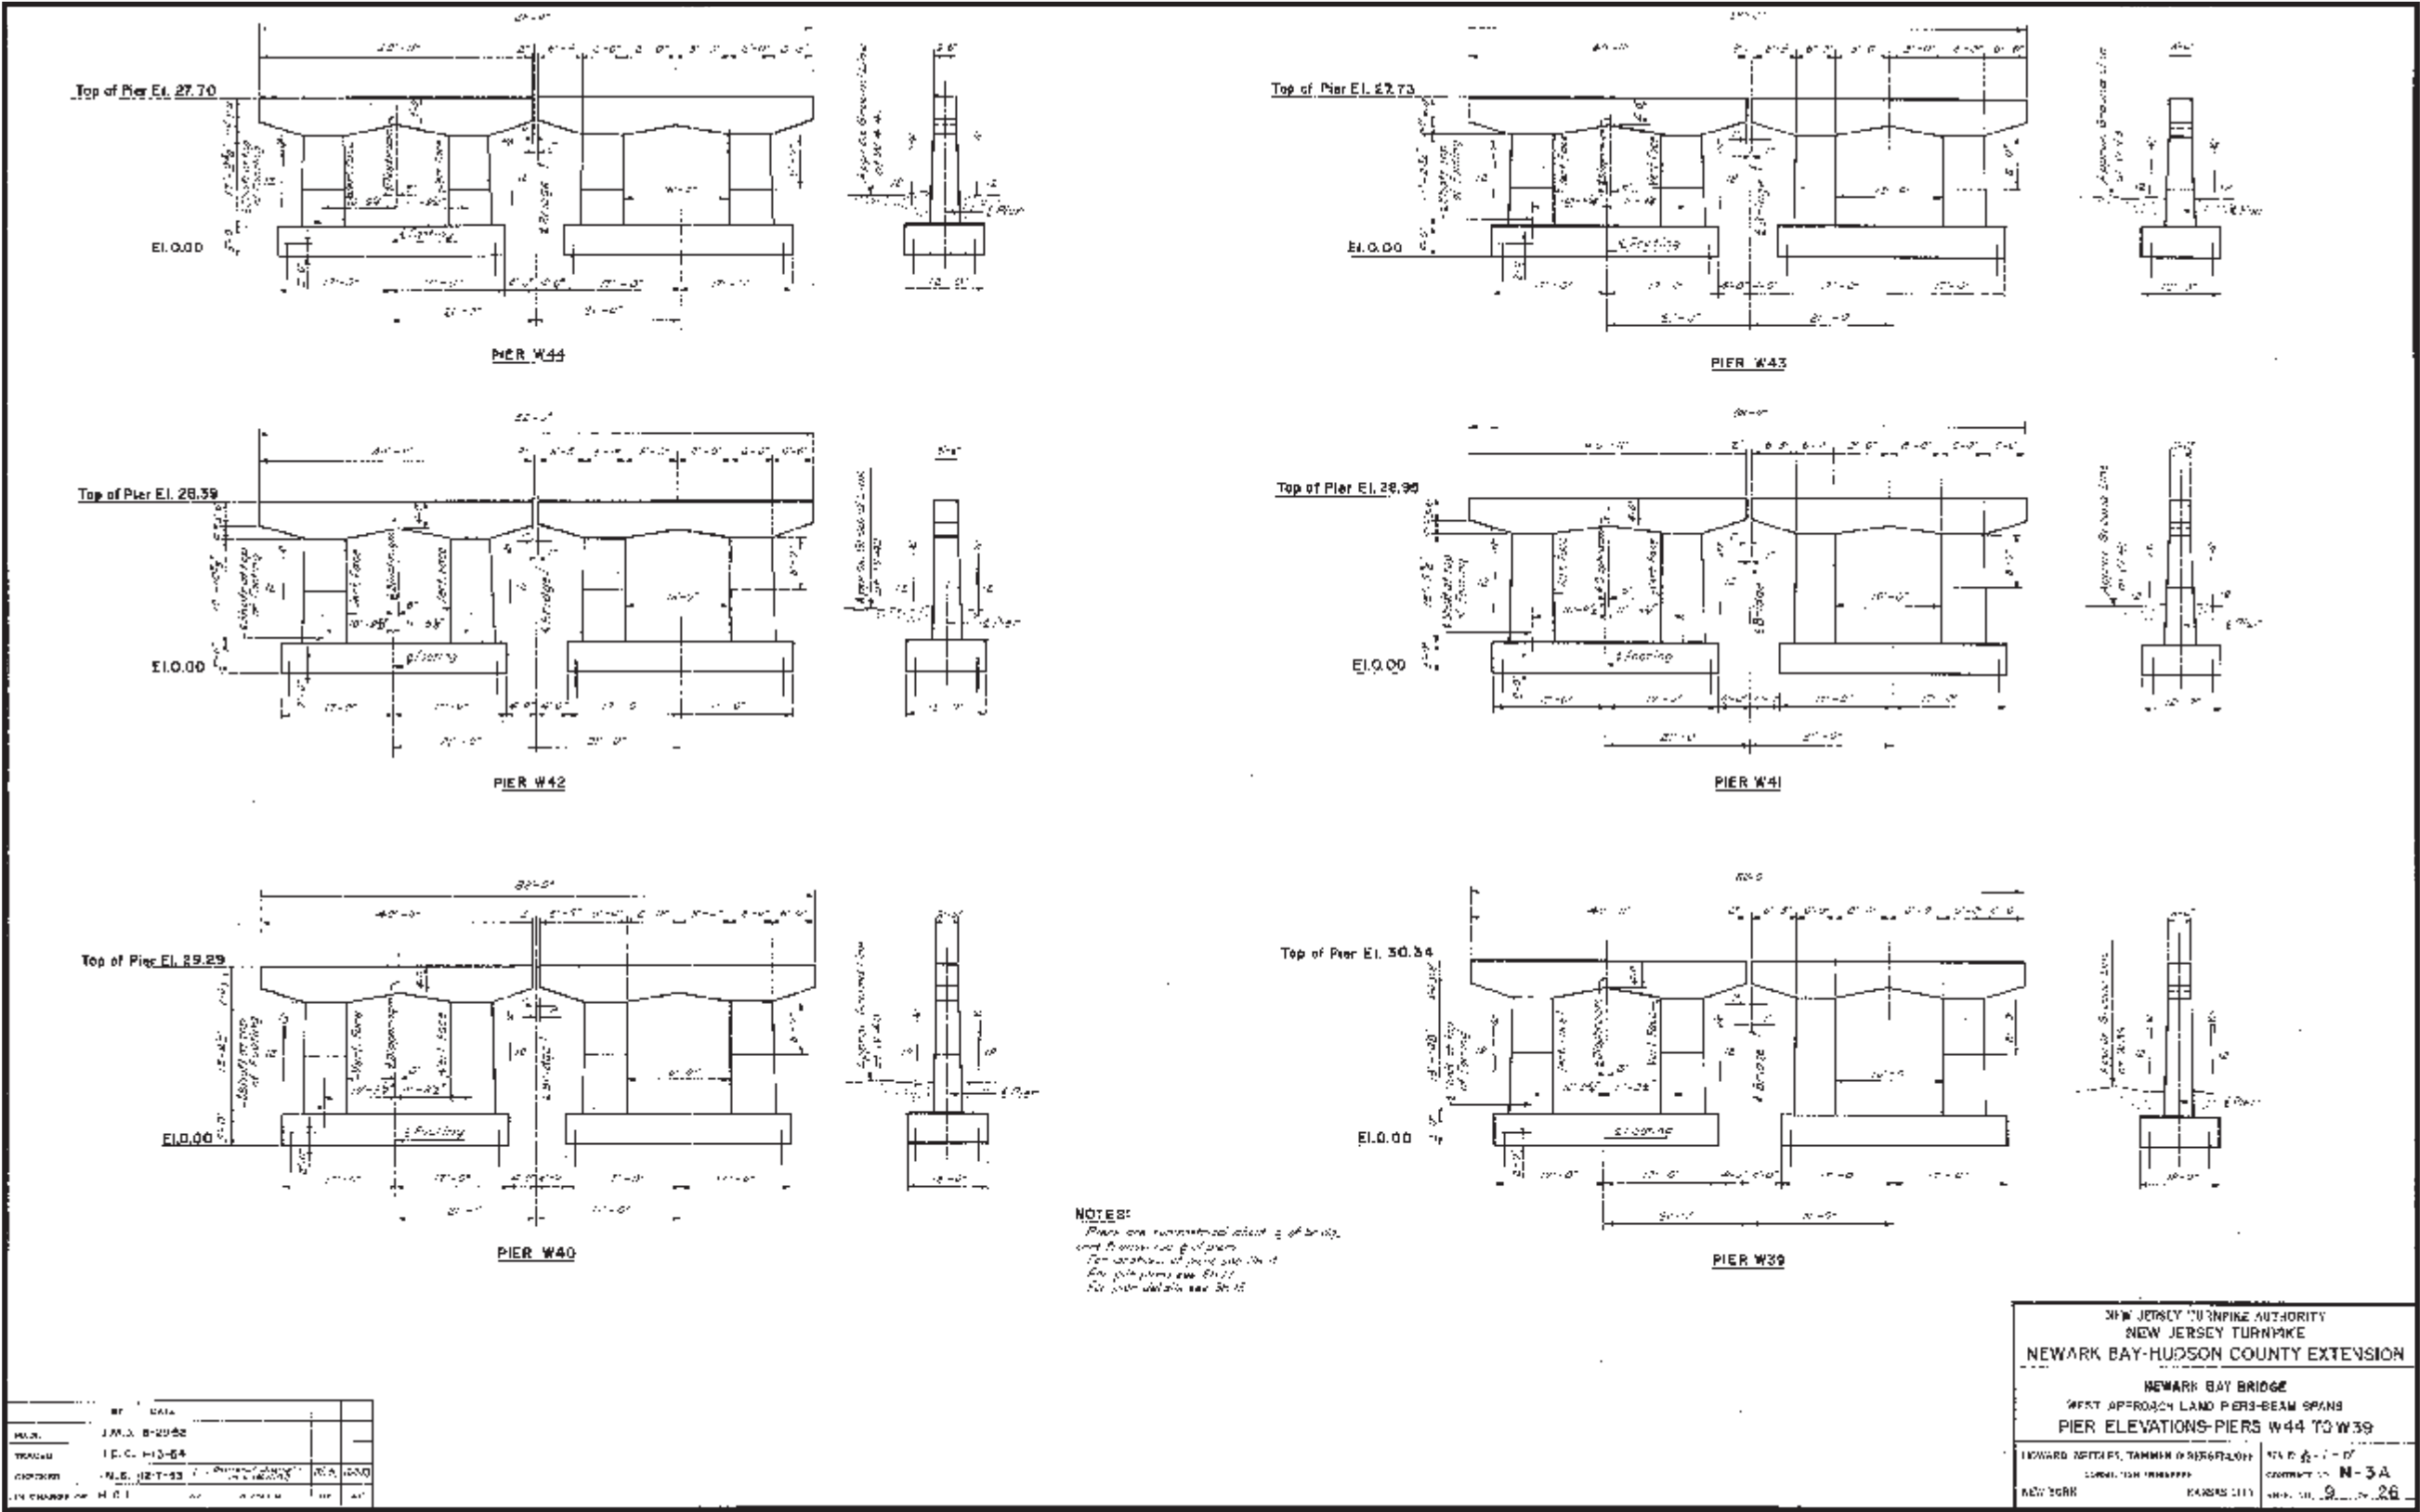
1952 drawing of the Newark Bay Bridge depicting typical land piers supporting beam spans on the west approach (HNTB 1952d).
